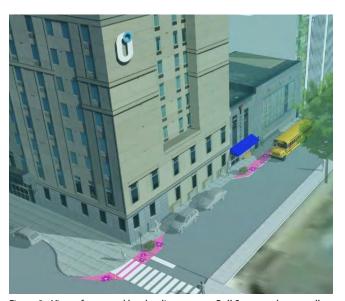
View of proposed bus loading zone on Bell Street and crosswalk enhancements at the intersection of Bell Street and Washington Boulevard.
